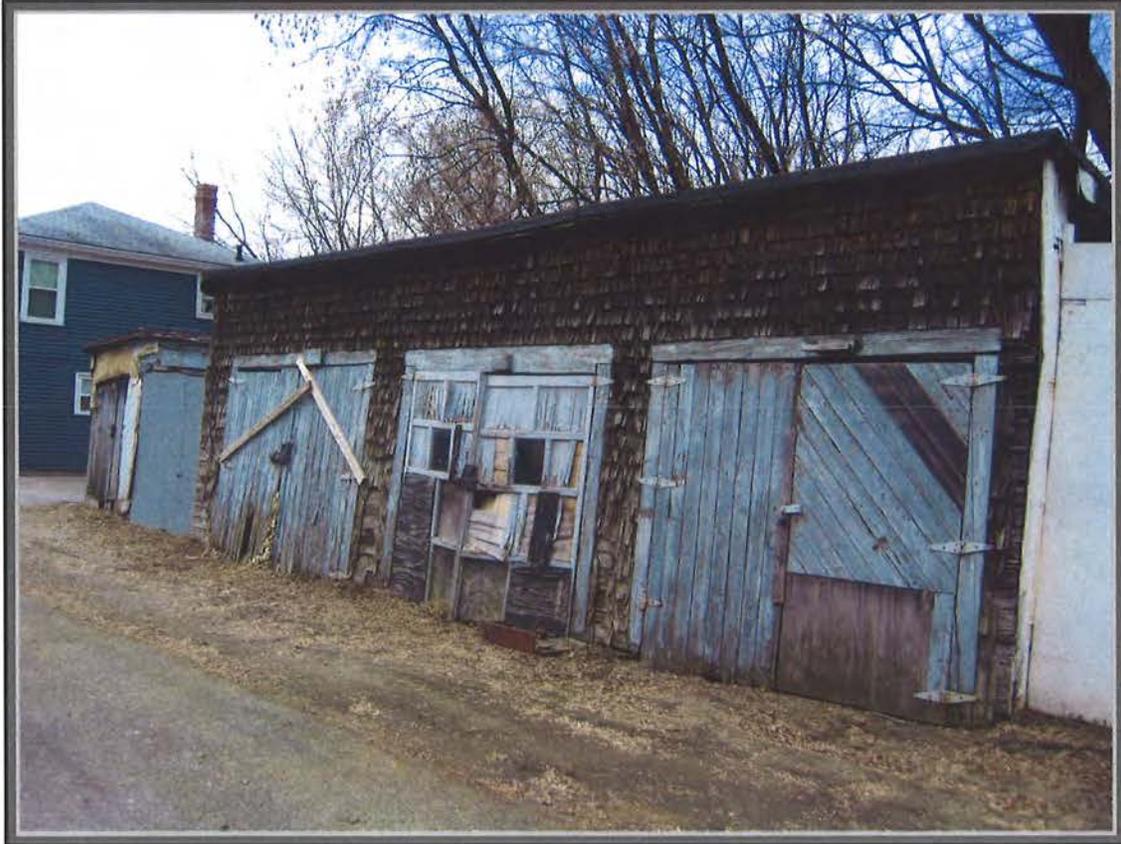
taken August 27, 2014 continuing neglect and deterioration of garages filled with debris.
